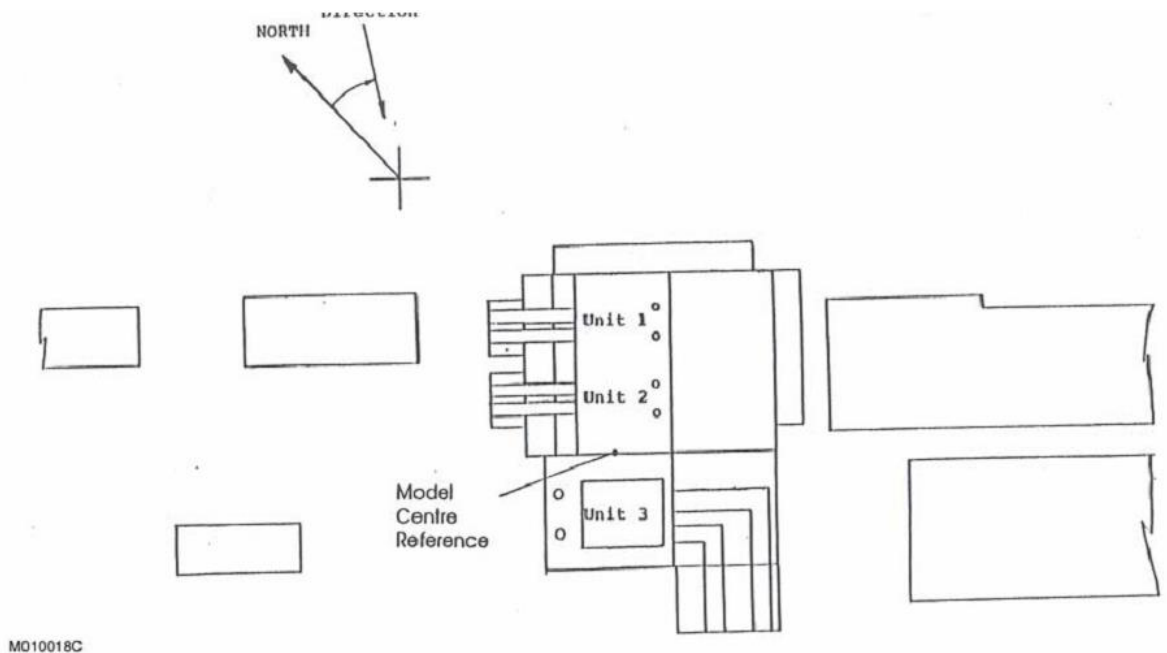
Plan view of the Lee Power Plant model and nearby buildings showing the power station units and the zero reference position used in the Monash wind tunnel tests.
